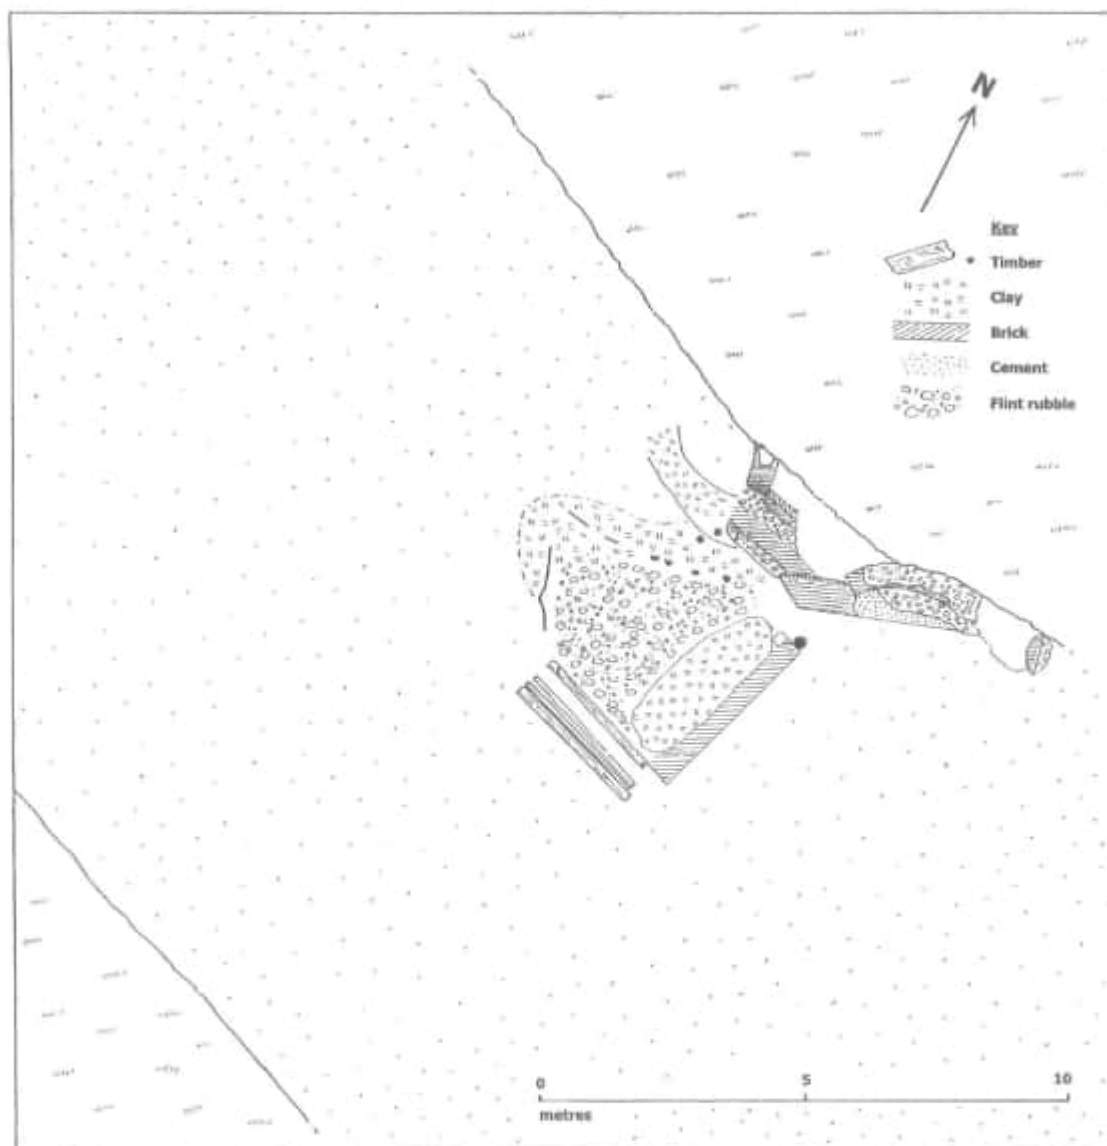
Area 5, plan of the bridge footings in the lower stream
